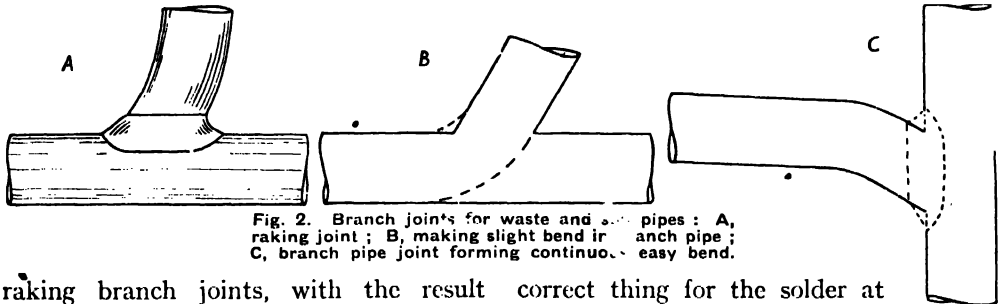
Branch joints for waste and soil pipes: A, raking joint; B, making slight bend in branch pipe; C, branch pipe joint forming continuous bend.
